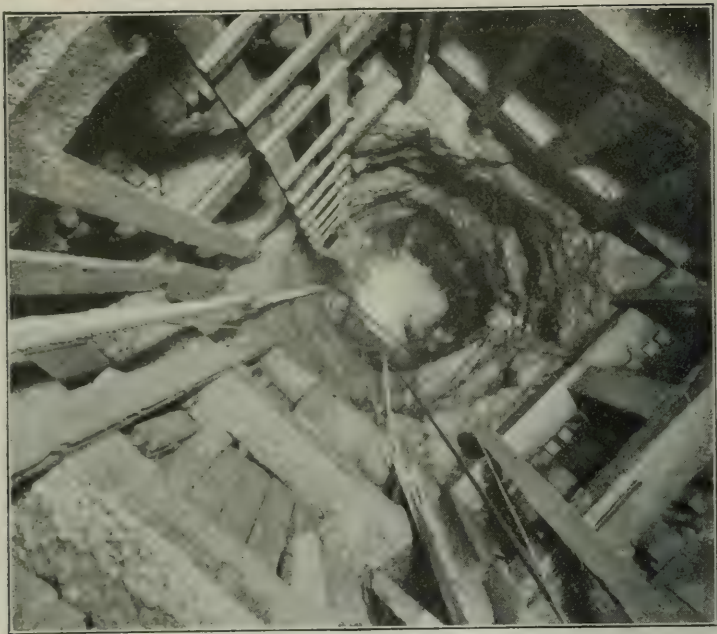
Quarry St. Tunnel, Shaft Construction near Rock.
